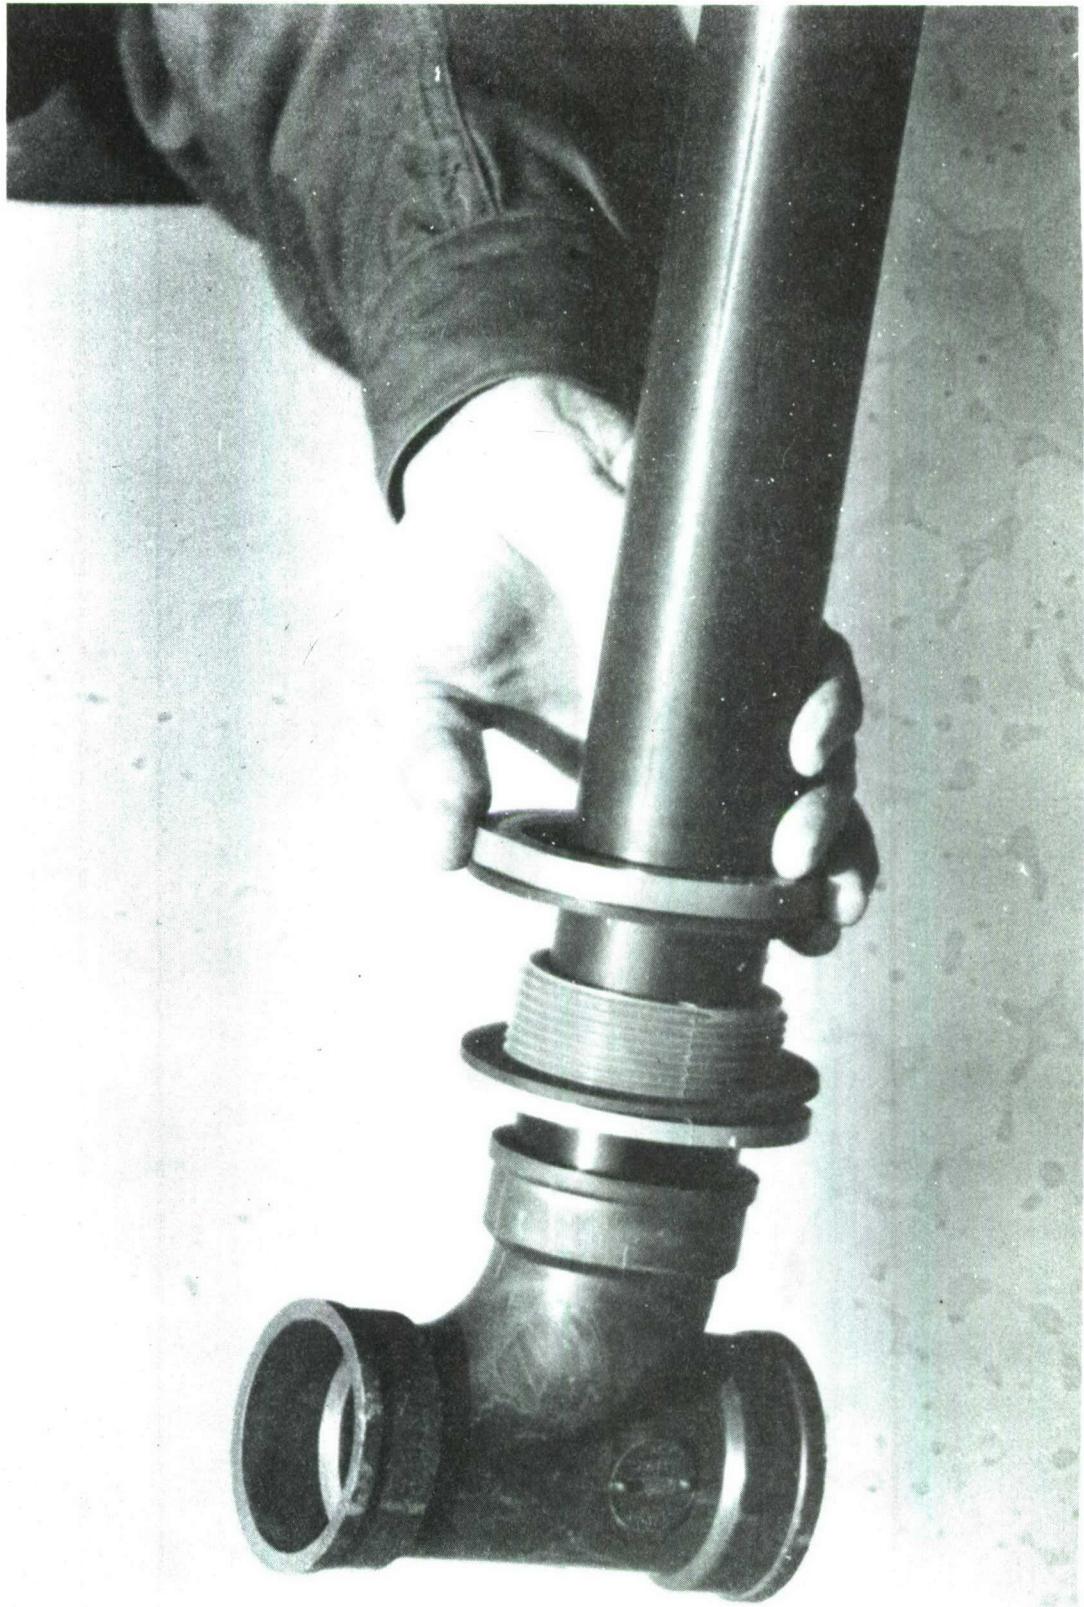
Start assembly of unit - Remove nut and 1 gasket from flange on 2" pipe with tee.
